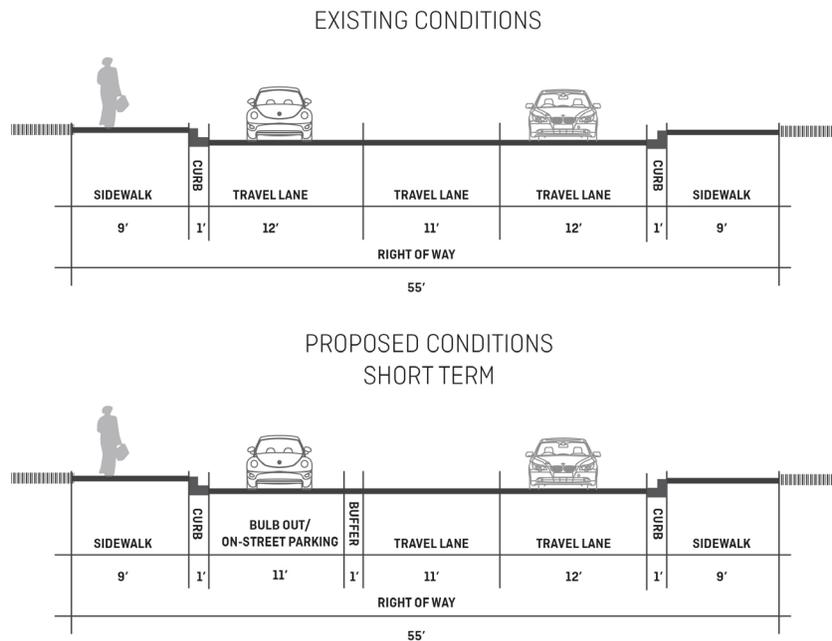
Short Term Scenario- Lane Elimination with On-street Parking
